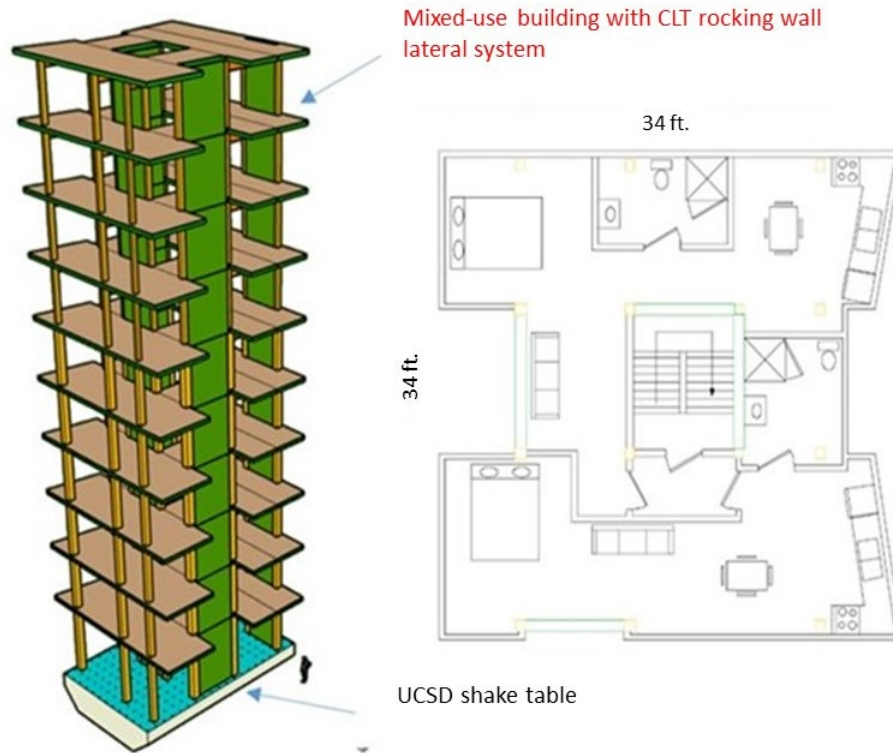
Structural system of the 10-storey building (left) and typical residential floor plan (right).
